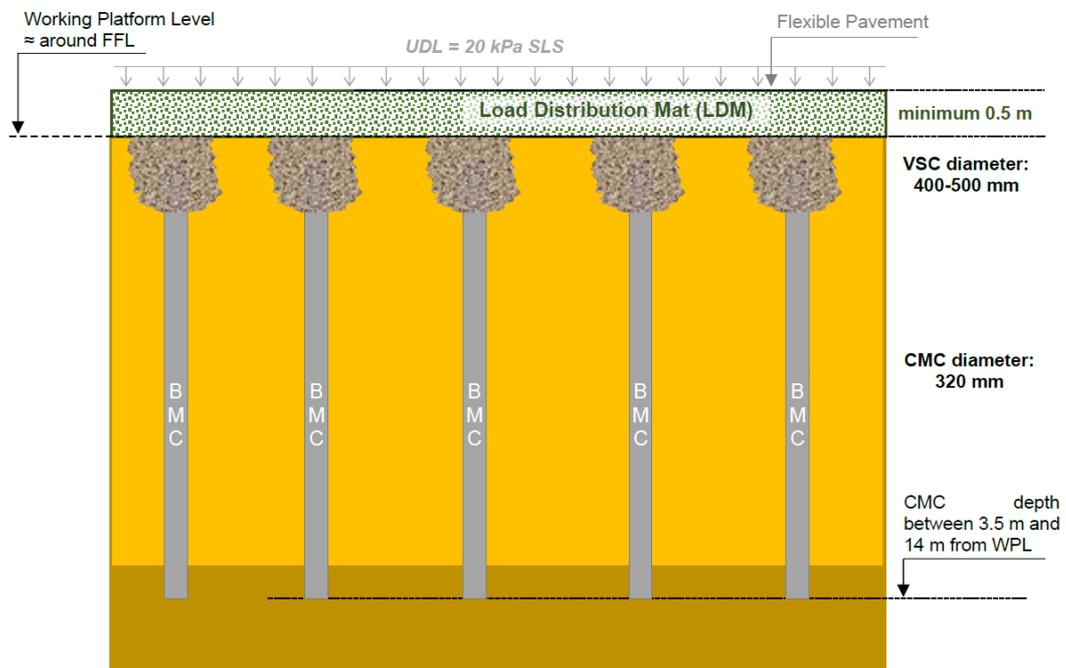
Typical cross-section of foundation and ground floor slab over CMCs
